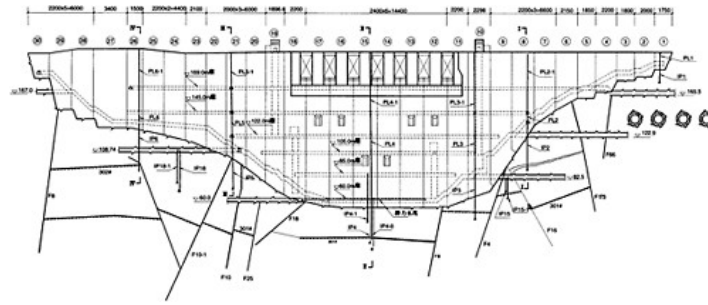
The sketch layout of deformation monitoring on Geheyan dam.
